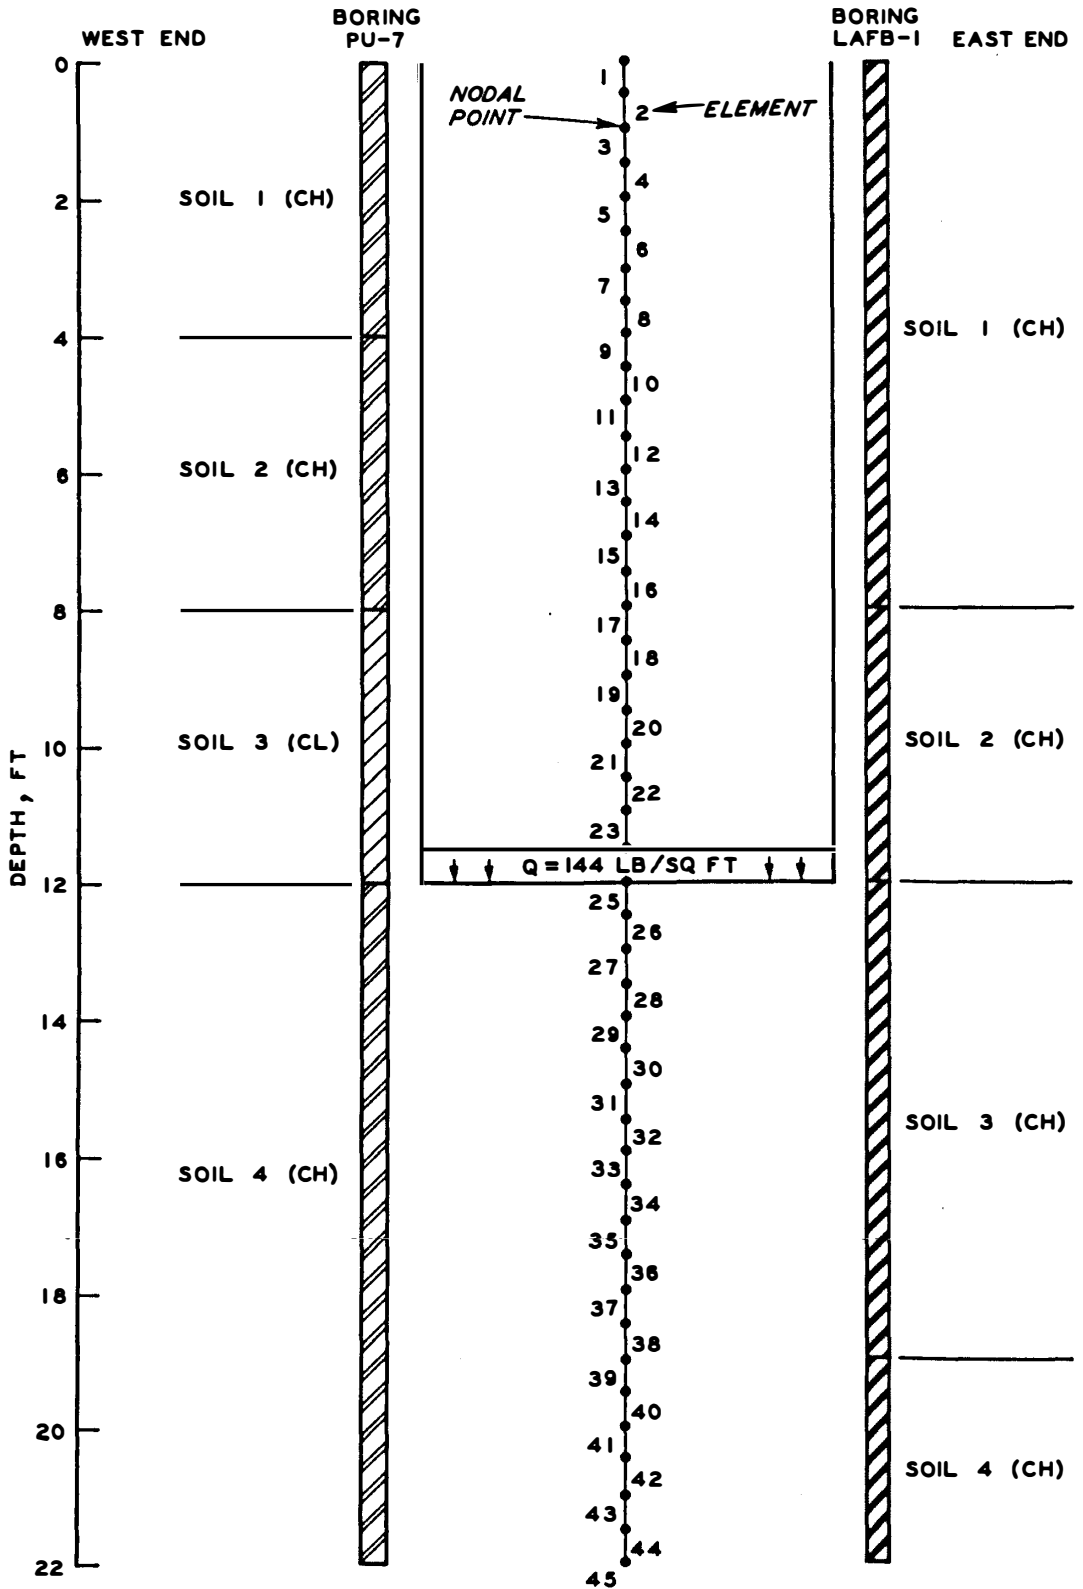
Slab foundation in excavation 12 ft below ground surface with deep water table
